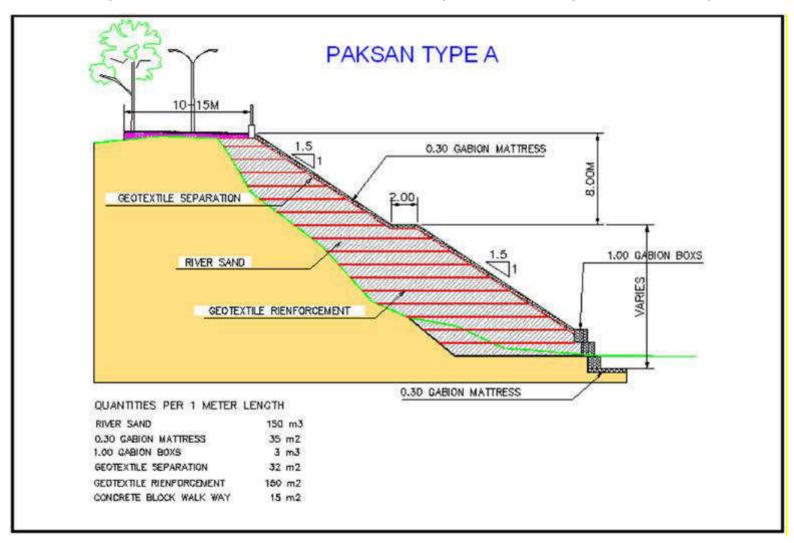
Cross section of the Pakxan riverbank protection (Mekong River to road bridge)
